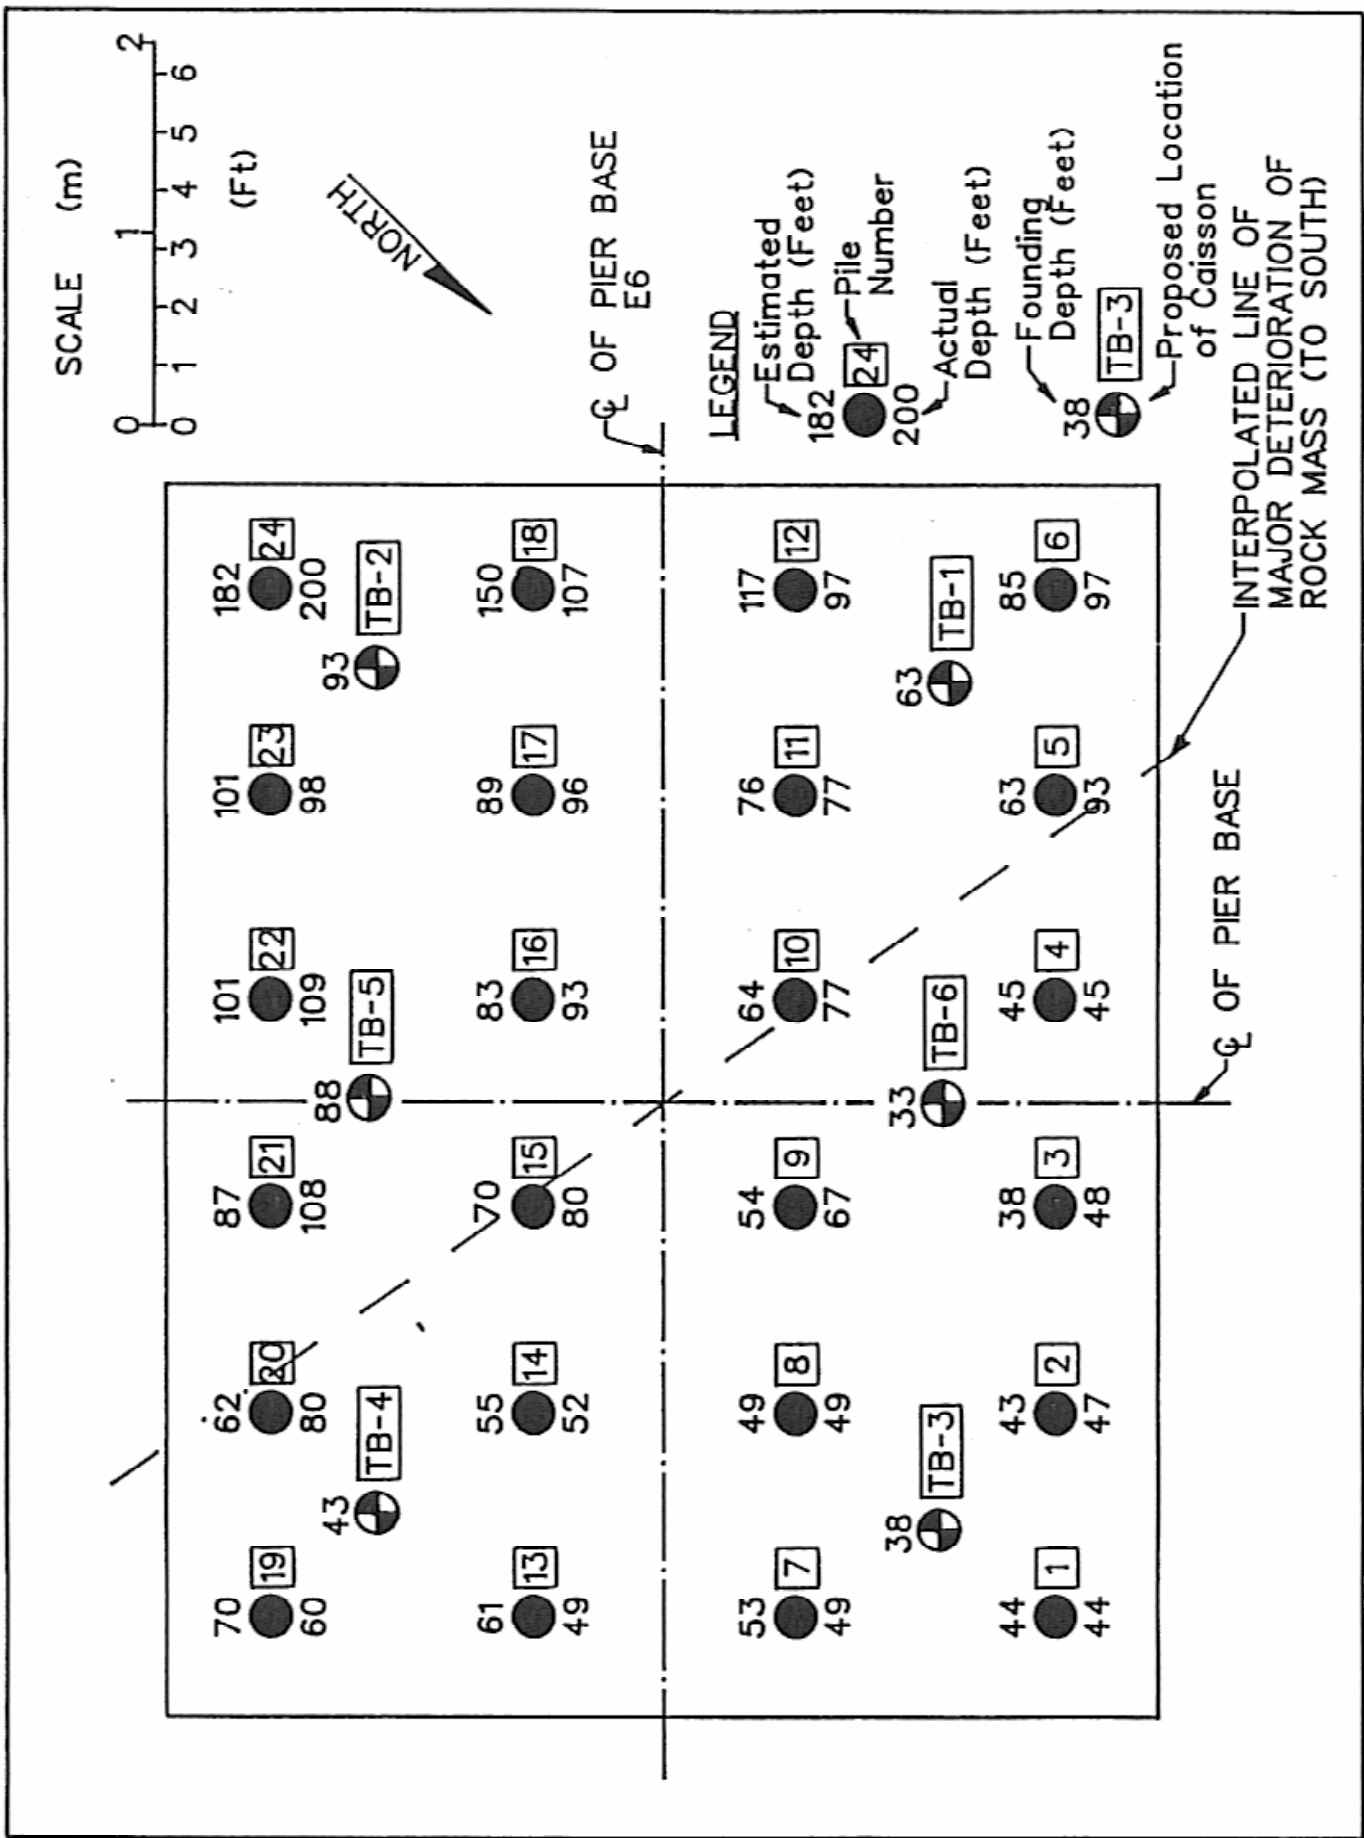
Actual pin pile lengths and foreseen caisson depths. Pier E6, I-78 Bridge, Warren County, NJ.
